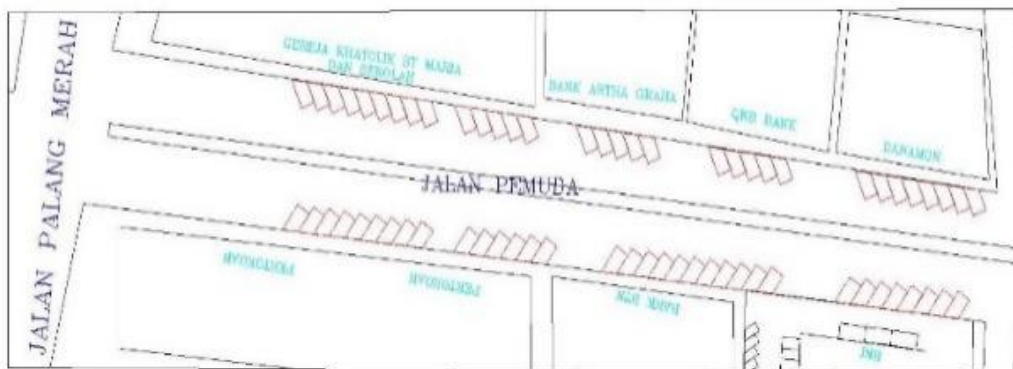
Alternative parking arrangement 3 Section B corner 60°
